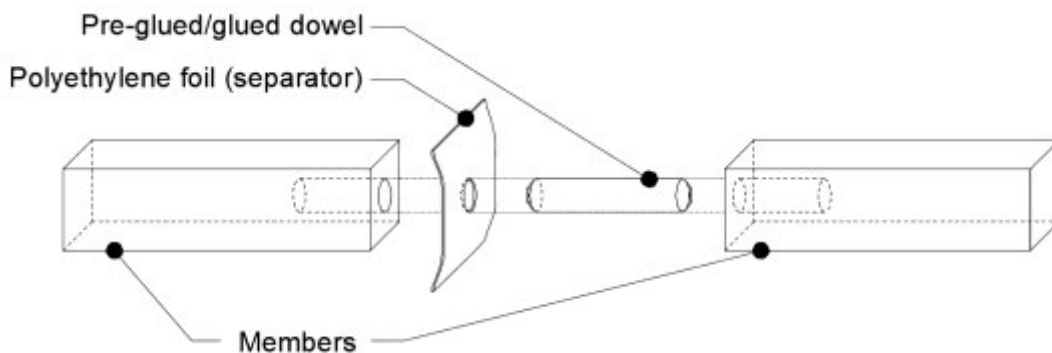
Assembly of a typical test specimen used for the withdrawal test
